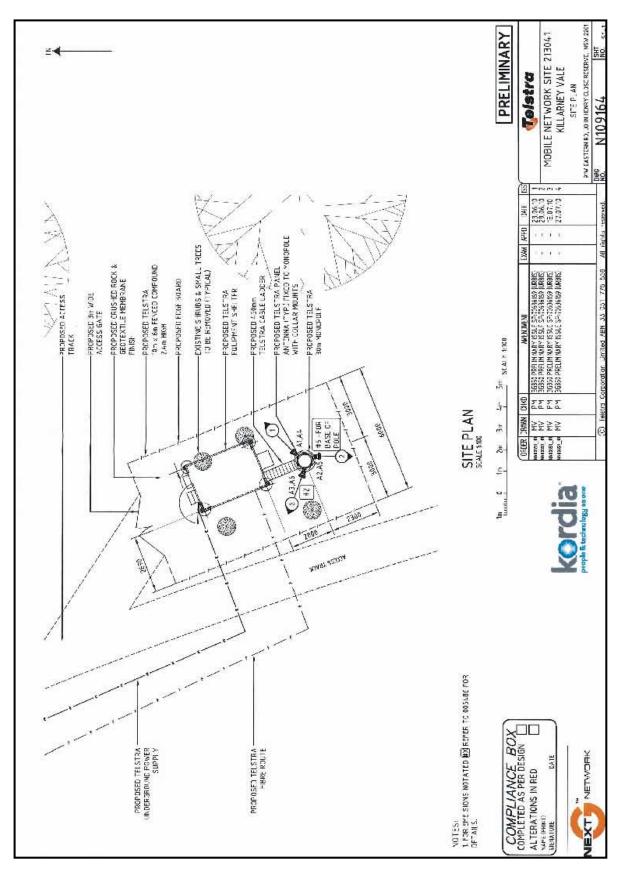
Site plans showing location of proposed telecommunications facility.
